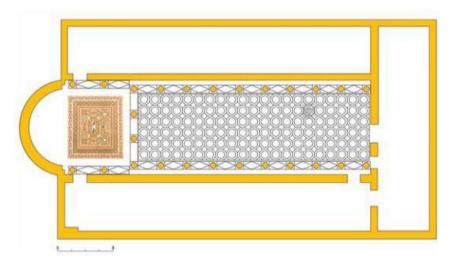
Assos The West Church Plan (Clarke et al., 1902)
